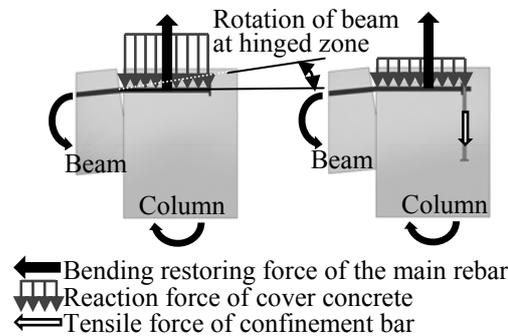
Resisting Mechanism of Beam Main Rebar Anchored in Joint
